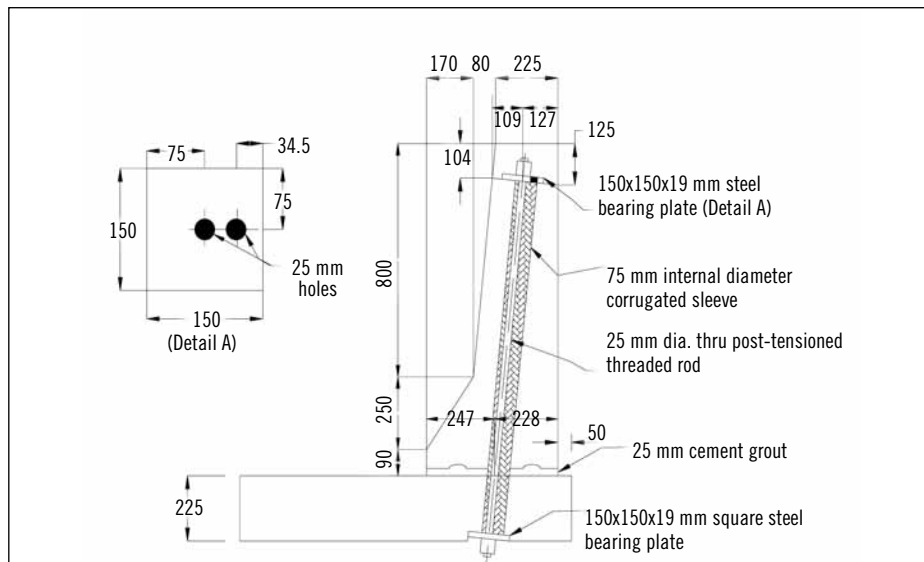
Structural Details of the Proposed Precast Barrier Wall Connections.
